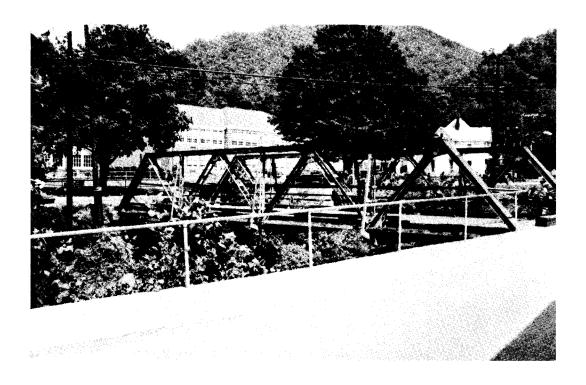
A typical twentieth century pony truss with riveted connections built by HIPCO Steel Bridges in 1925.
